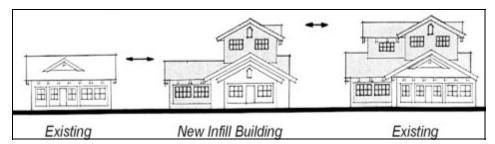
Second Floor Addition Design to Minimize Impact on Smaller House
